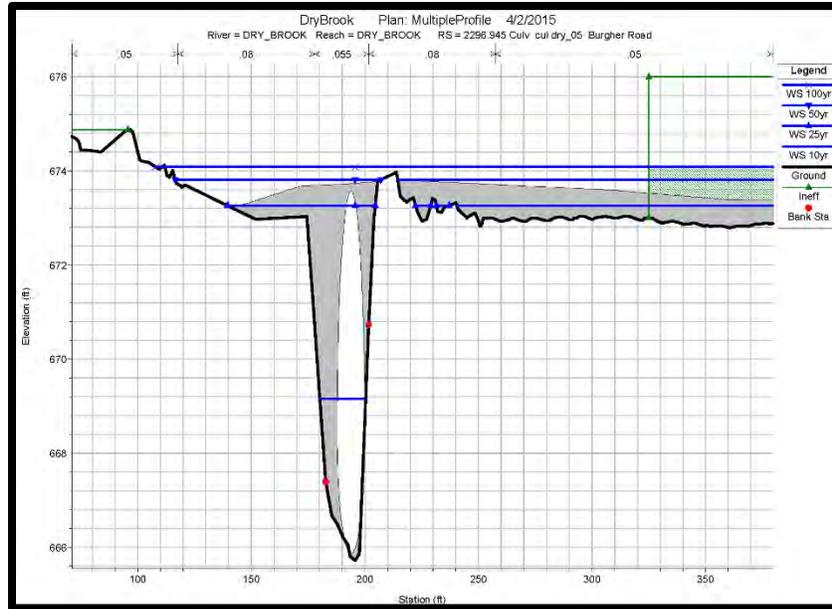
Section View of Existing Hydraulic Conditions at Burgher Road
